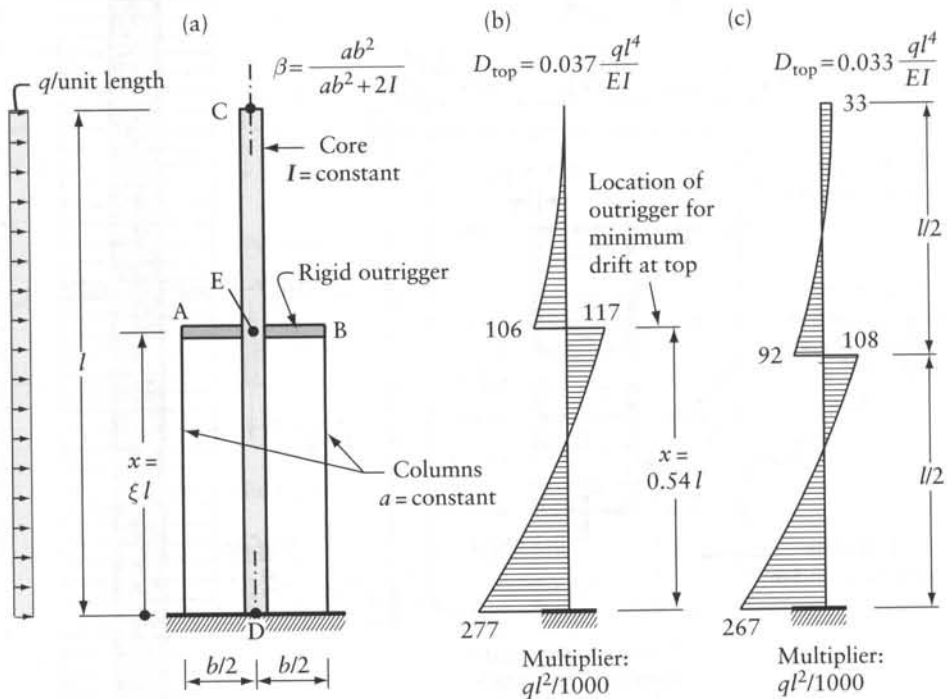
Core wall with one and two rigid outriggers. (a) Simplified model considering only bending deformation of the core and axial deformation of the columns. (b) Bending moment in core with one outrigger at $x = 0.54l$, with $\beta = 0.8$. (c) Bending moment in core with outriggers at top and at mid-height, with $\beta = 0.8$.
